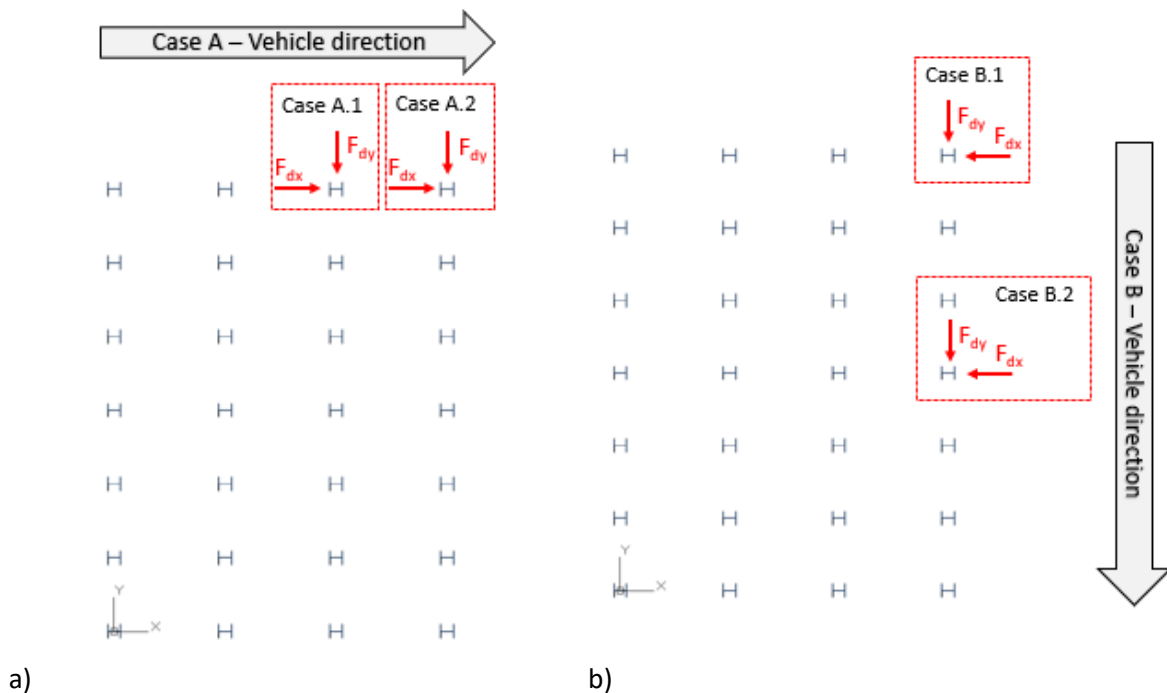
Plan view at ground floor level, columns assumed for impact analysis: a) case A; b) case B.
